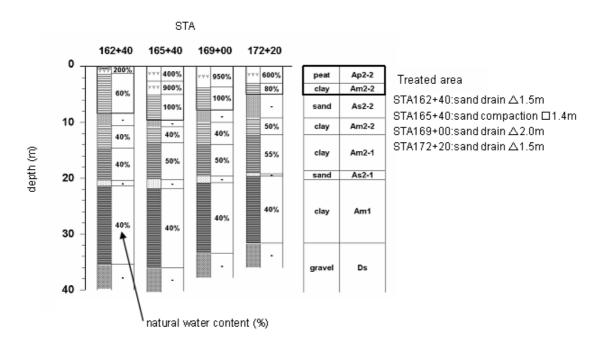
Subsoil profiles of analyzed sections in Ebetsu-Futo East works
